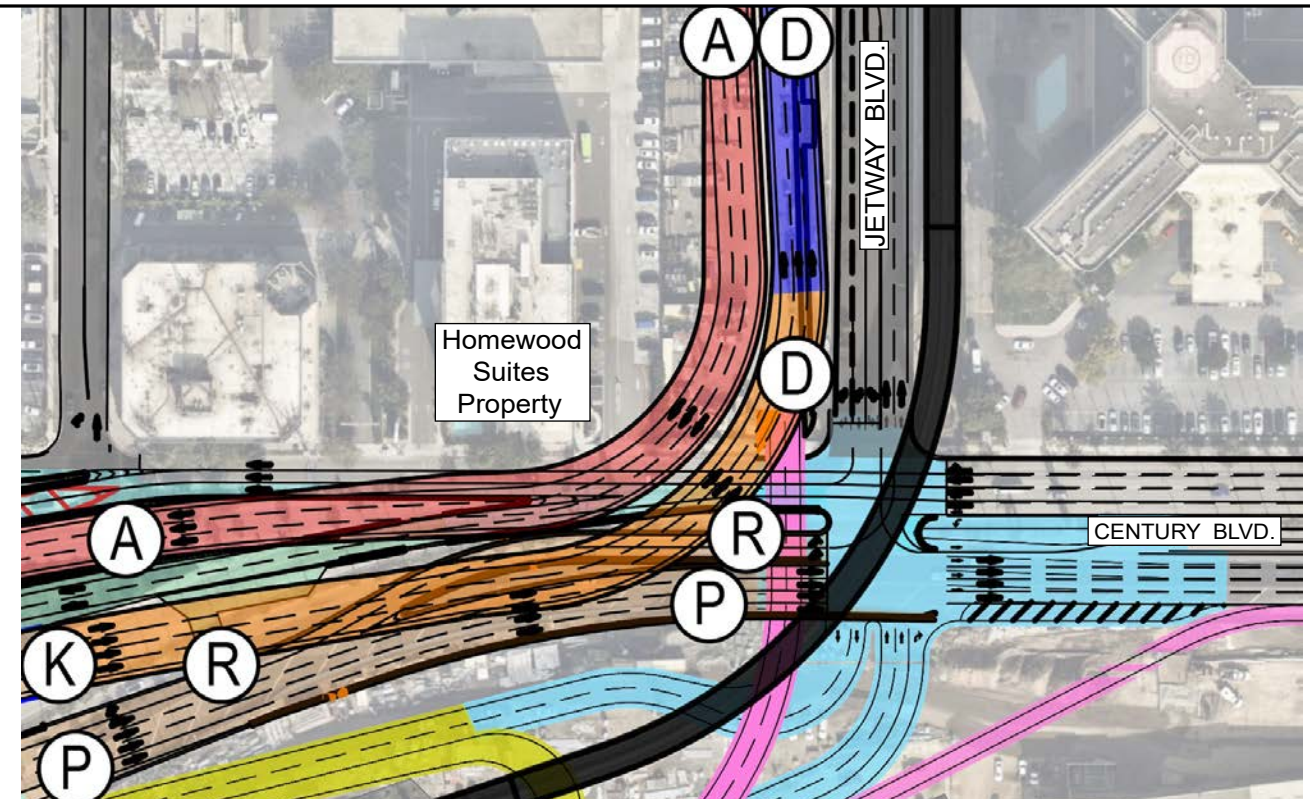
An aerial easement would be required at the Homewood Suites property to enable the elevated roadway structure.
